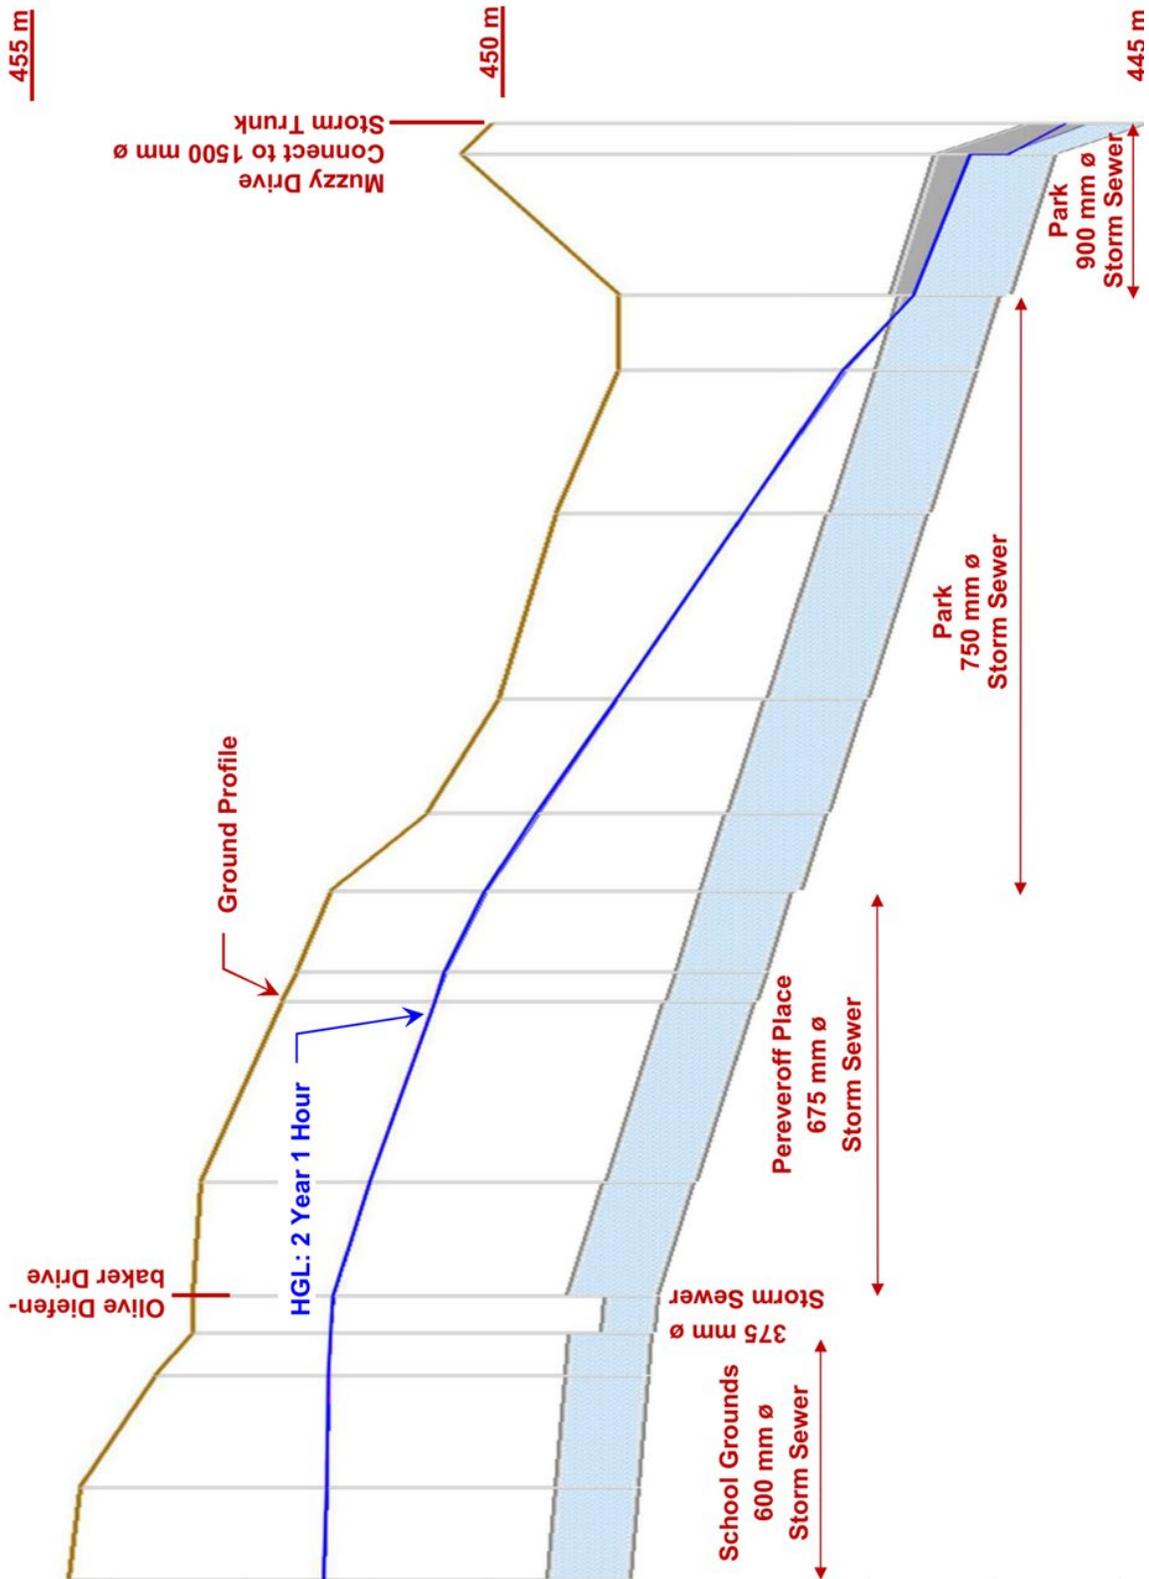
Existing Storm Sewer from School Grounds to Muzzy Drive
